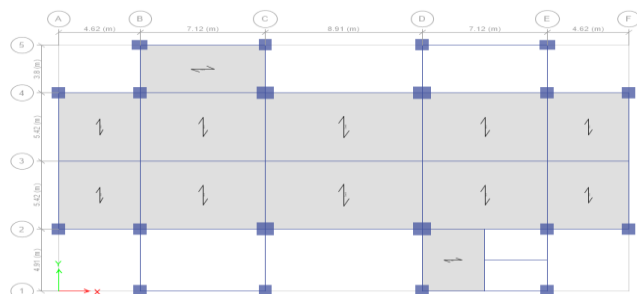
(a): Plan view of (G+16) Normal R.C. Building model
